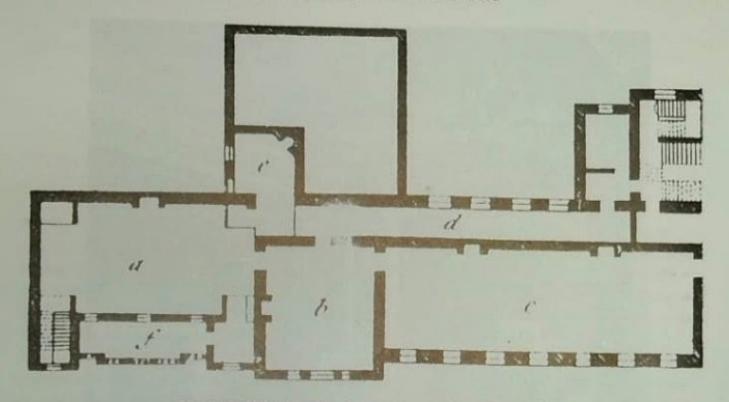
Fairchild, plan of the State Apartment at Stowe House, 1763.
